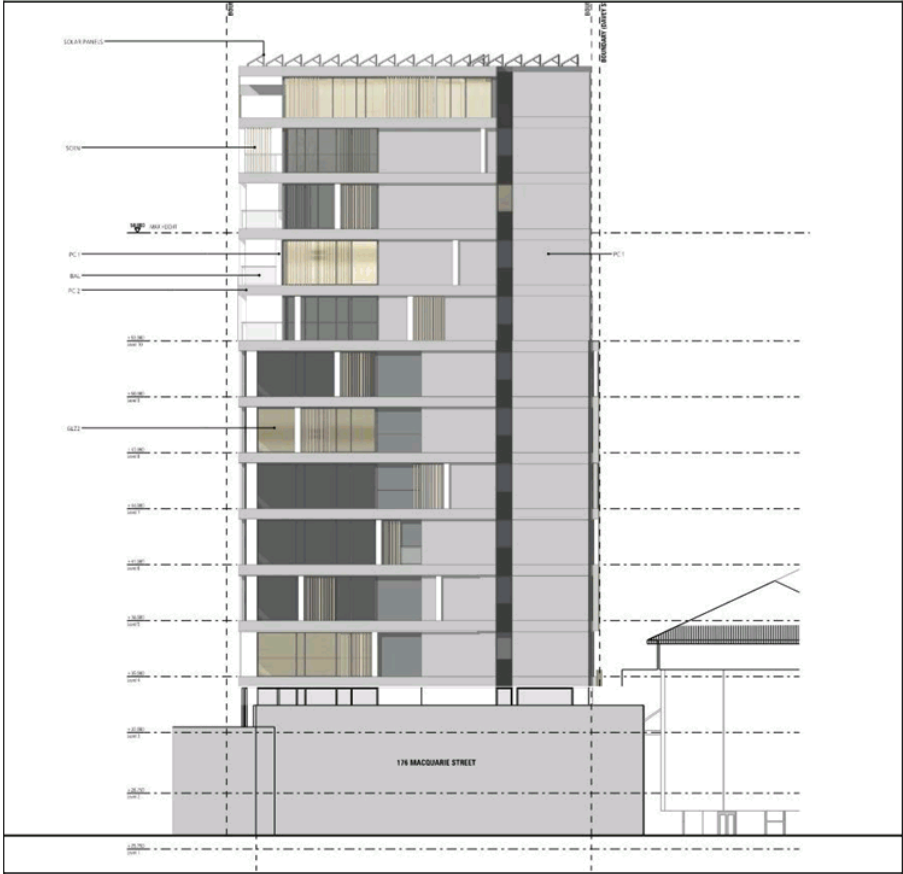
North-western (rear) elevation of the proposed building (Source: Irenelnc/JAWS).
